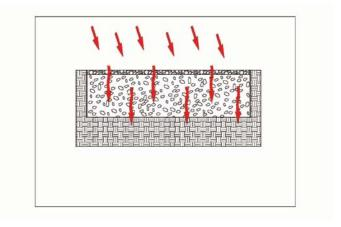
Rain on porous asphalt parking lots hits the surface and runs through pavement into a gravel reservoir below. Water then infiltrates into the ground, recharging groundwater over time.
